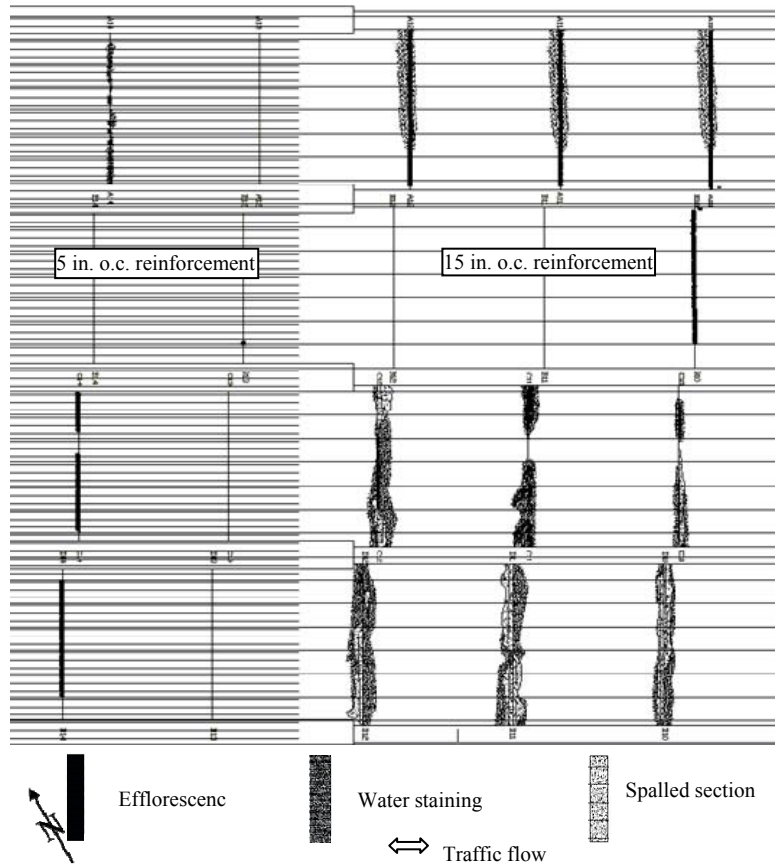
Relationship Between Longitudinal Reinforcement Spacing in CIP topping and PPC Panel Deterioration (A. 5 in. spacing, B. 15 in. spacing)
